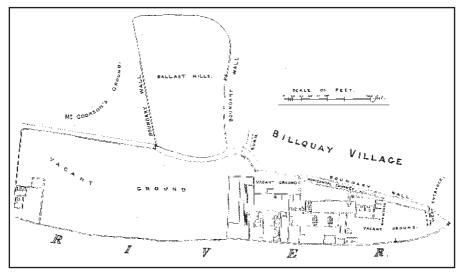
Surface plan of Bill Quay Works, owned by Hall.
